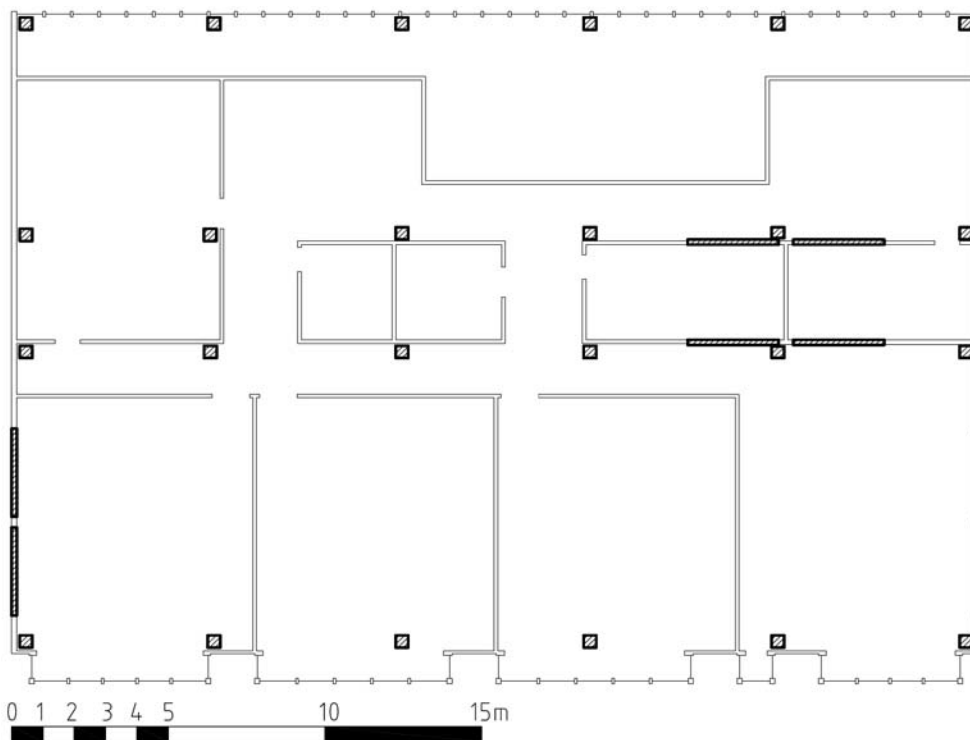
Plan section level 3 of the Timber building (structural columns).
